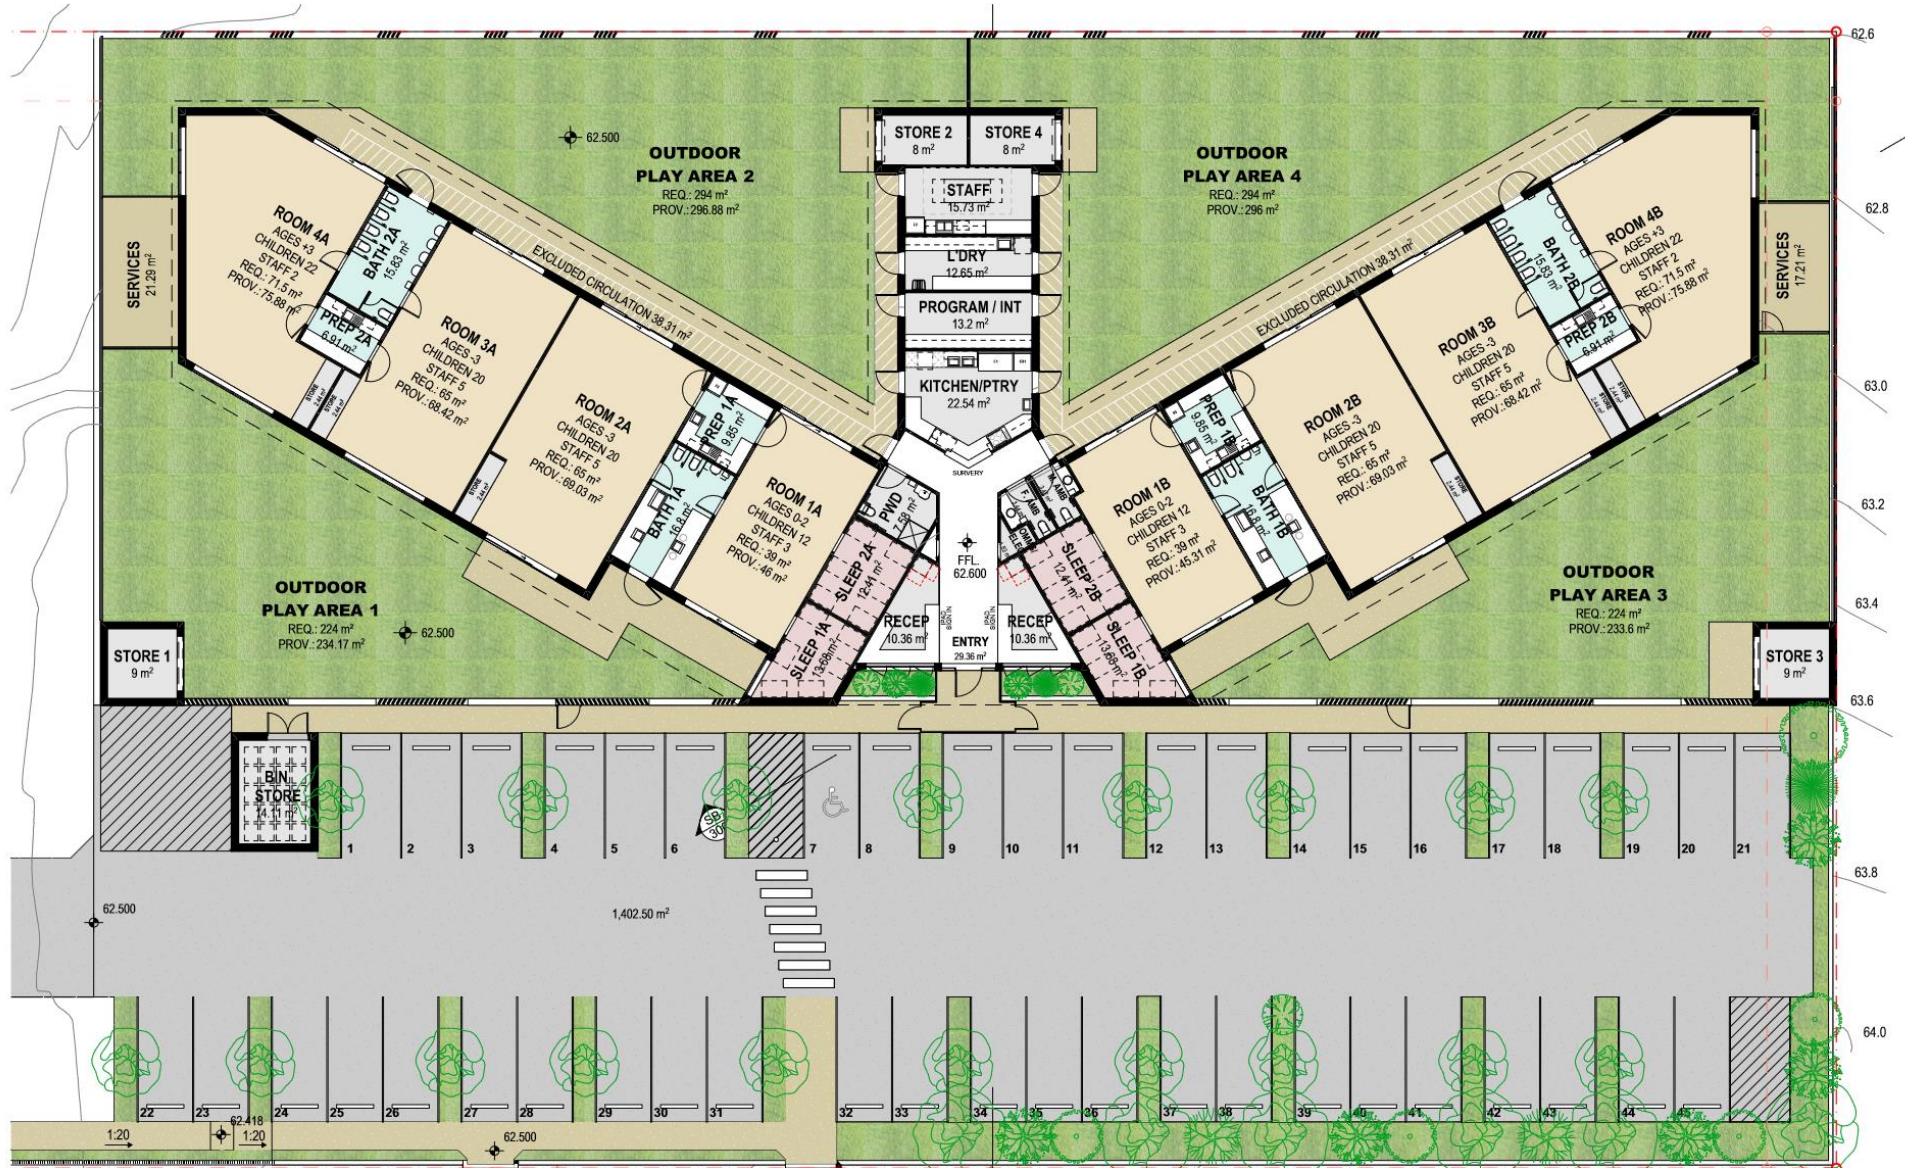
PARK RIDGE CHILDCARE SITE LAYOUT PLAN
